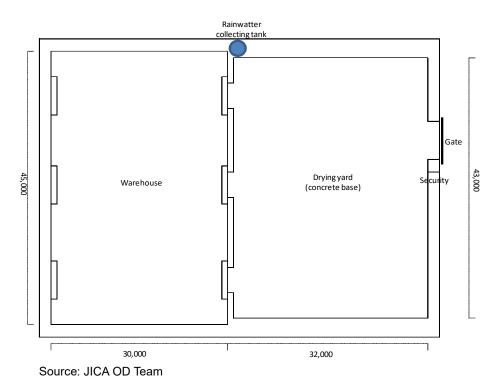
Outline Design of Building Facilities (Bulambuli)
